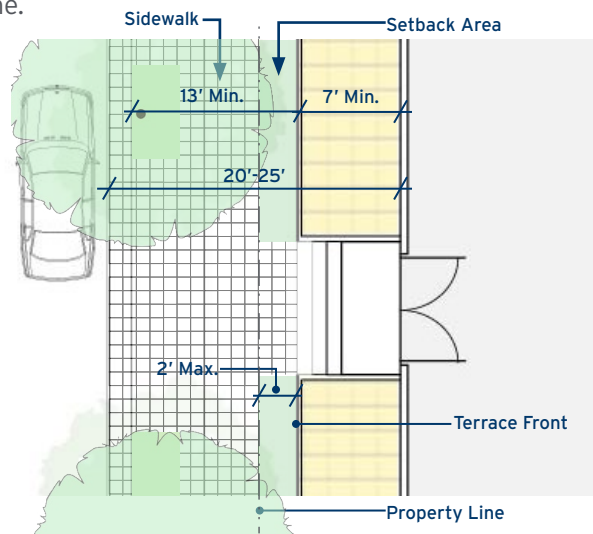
Raised Residential Terrace Conceptual Plan
